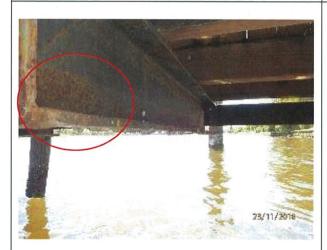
Early spot corrosion was evident to the steel sheet pile members on the underside of the concrete deck. Note: Previous paint repairs/patches were evident.
